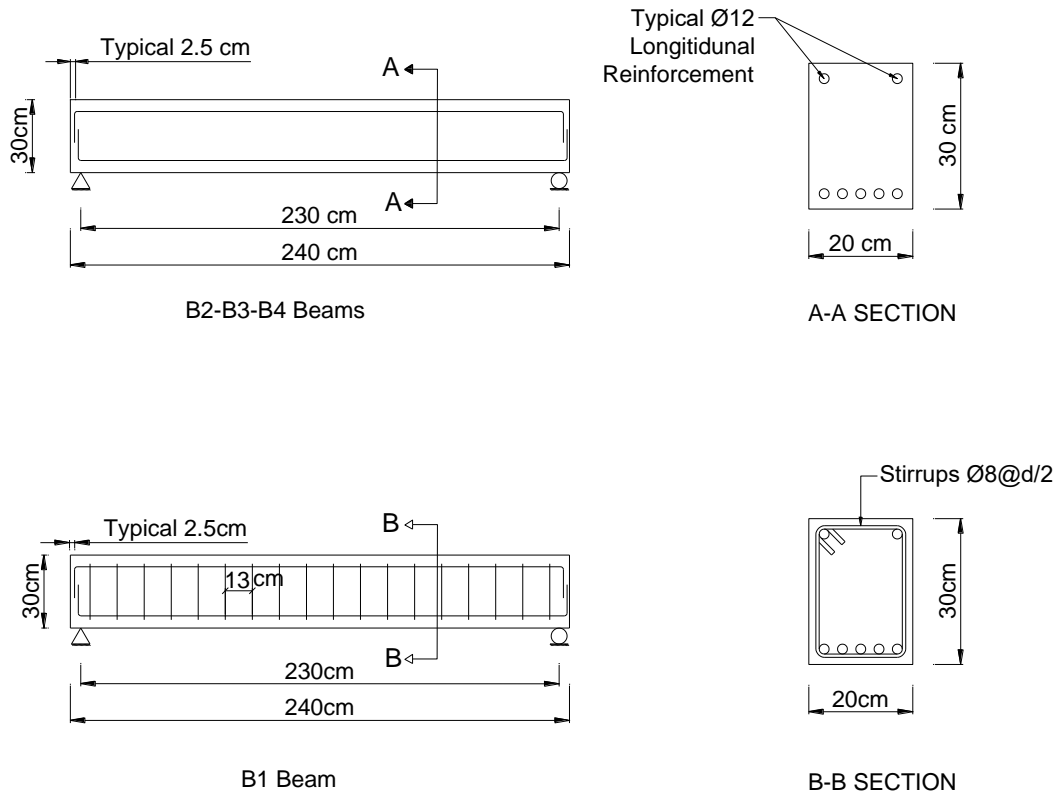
Detailing of B1, B2, B3 and B4 beams
